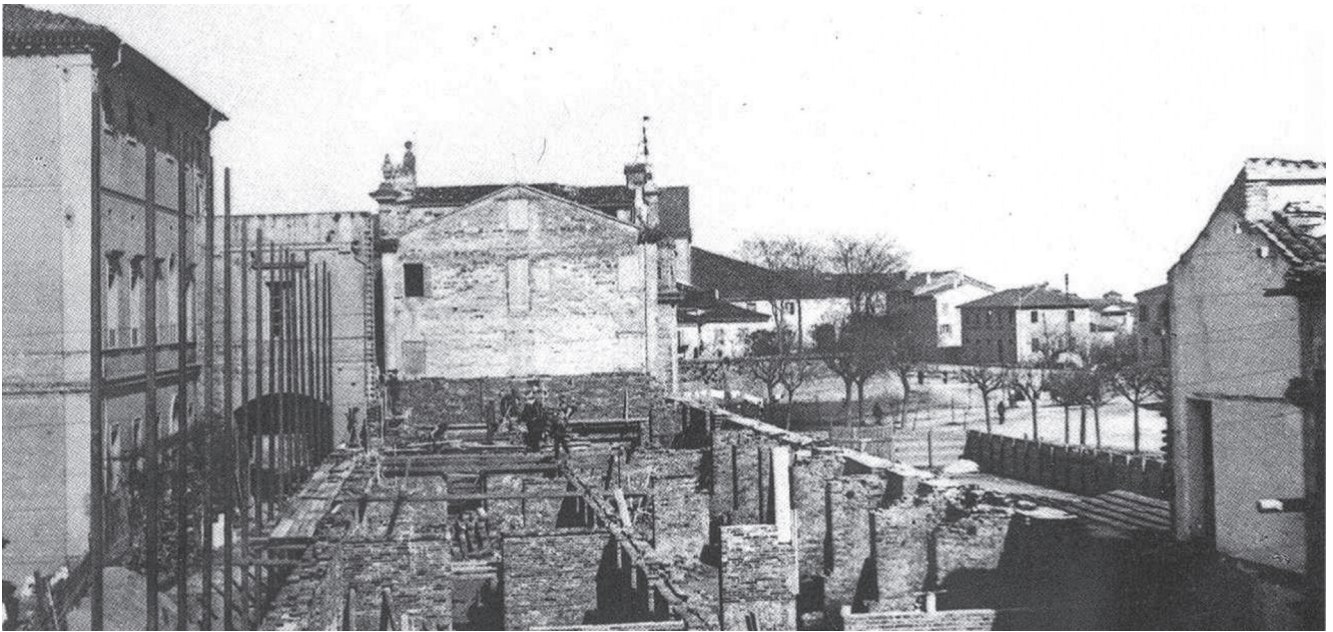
Opera Pia Service Wing construction supported by the eighteenth century walls. The spine walls act as dividing element to the ground floor premises (1926 project, built in 1929)
